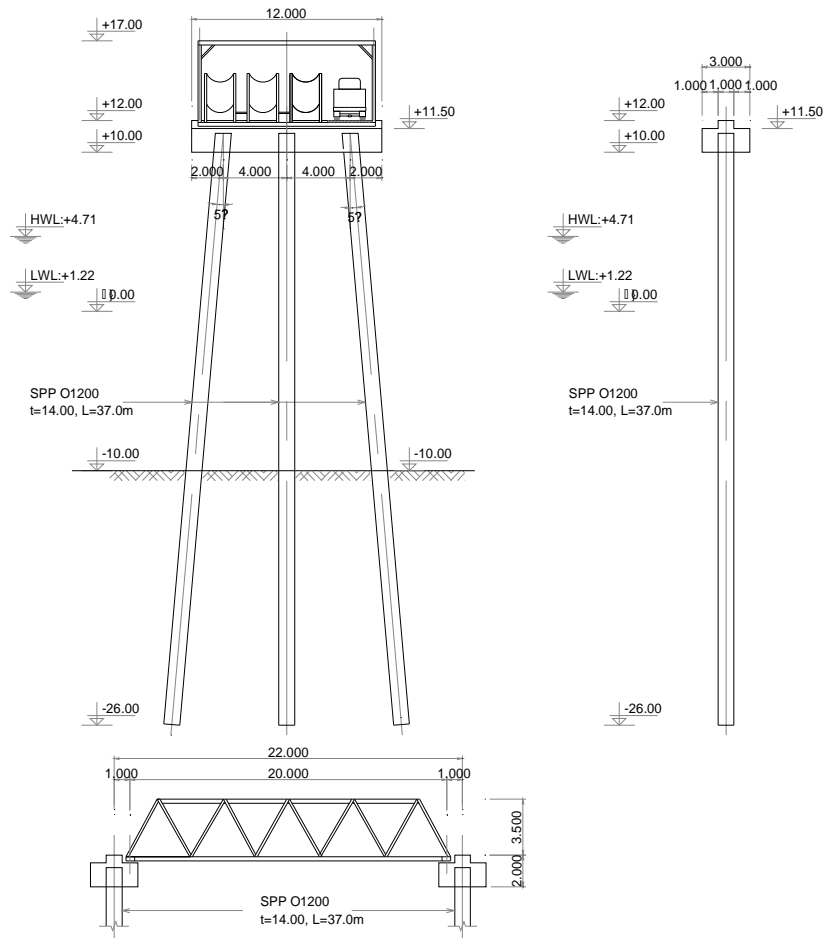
Typical Drawings of Trestle for Belt Conveyor
